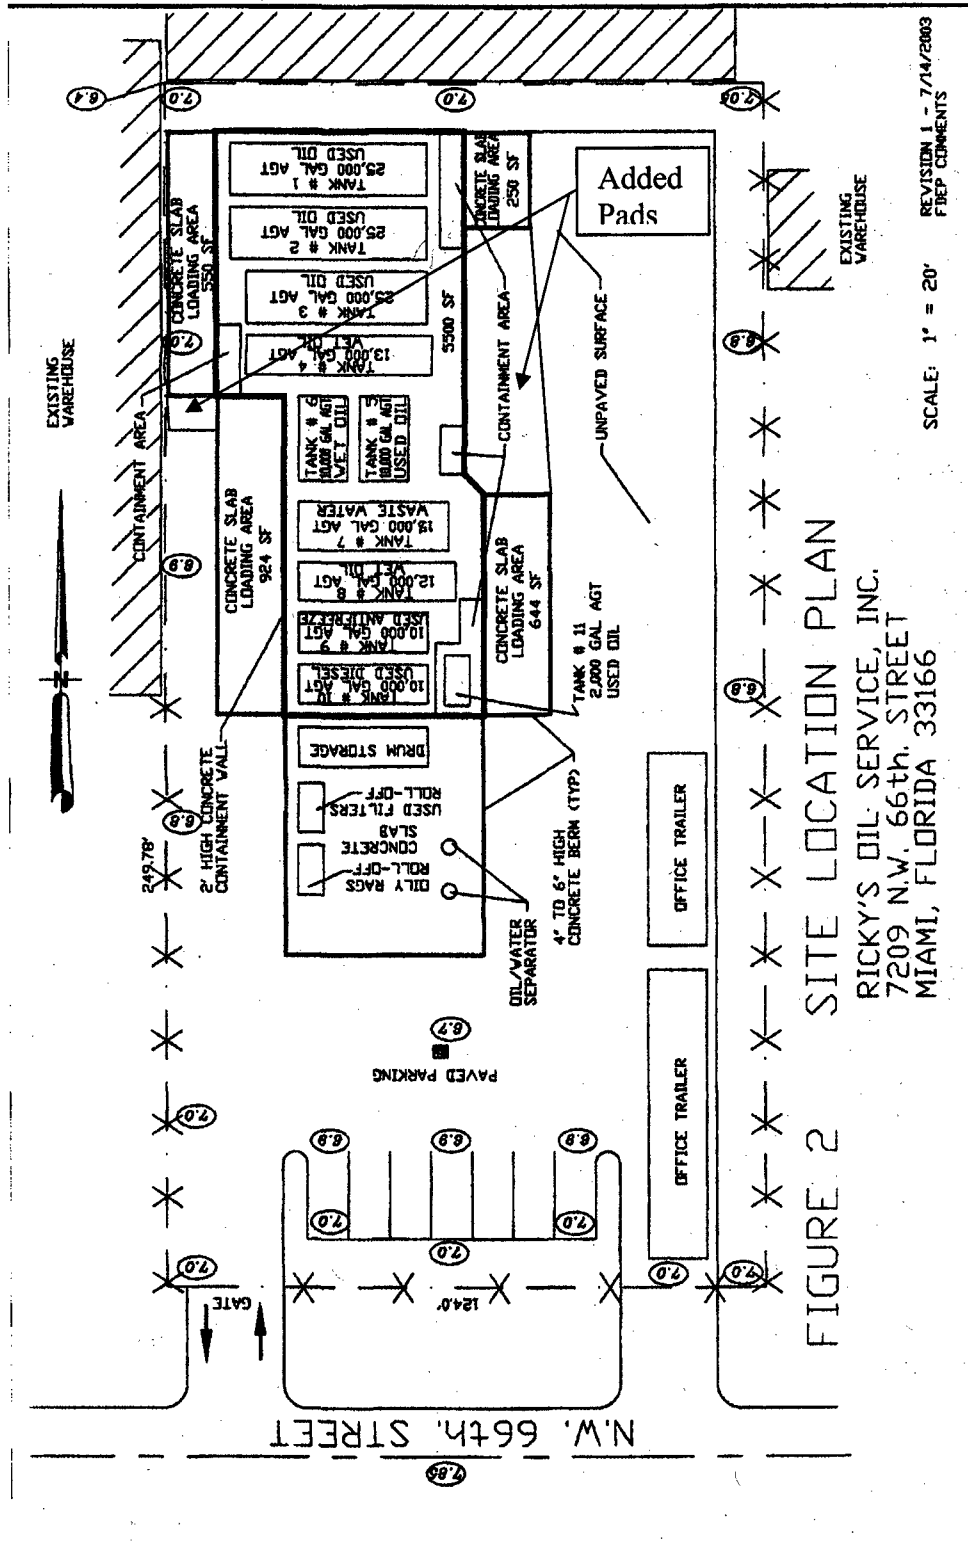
Site Location Plan (updated from previous Application to show two slabs added)
